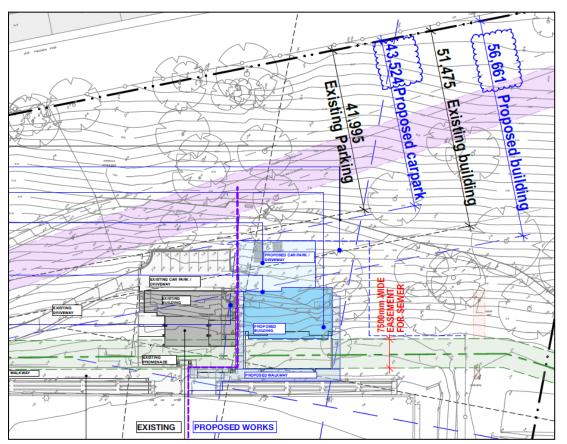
Proposed site plan showing the new building (coloured blue) will be located clear of the 7.5m easement (coloured green) under DA-1321/2021/A.
